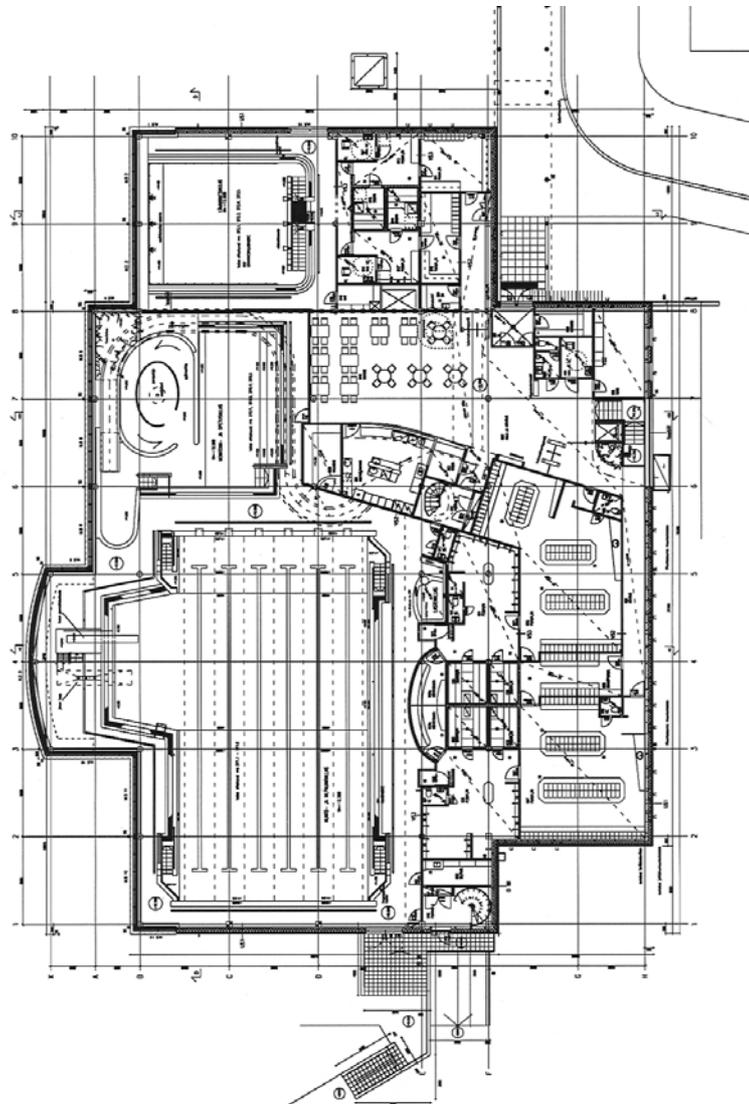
Ground floor plan of Kirkkonummi swimming bath.
